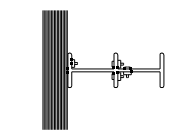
DETAIL OF A SINGLE WHITE OR SINGLE YELLOW DELINEATOR
